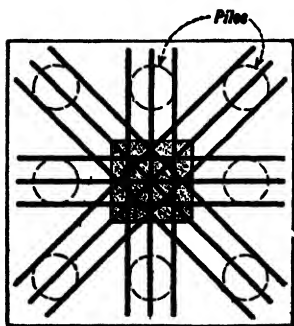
Incorrect Arrangement of Reinforcement above Piles. (See p. 516.)
